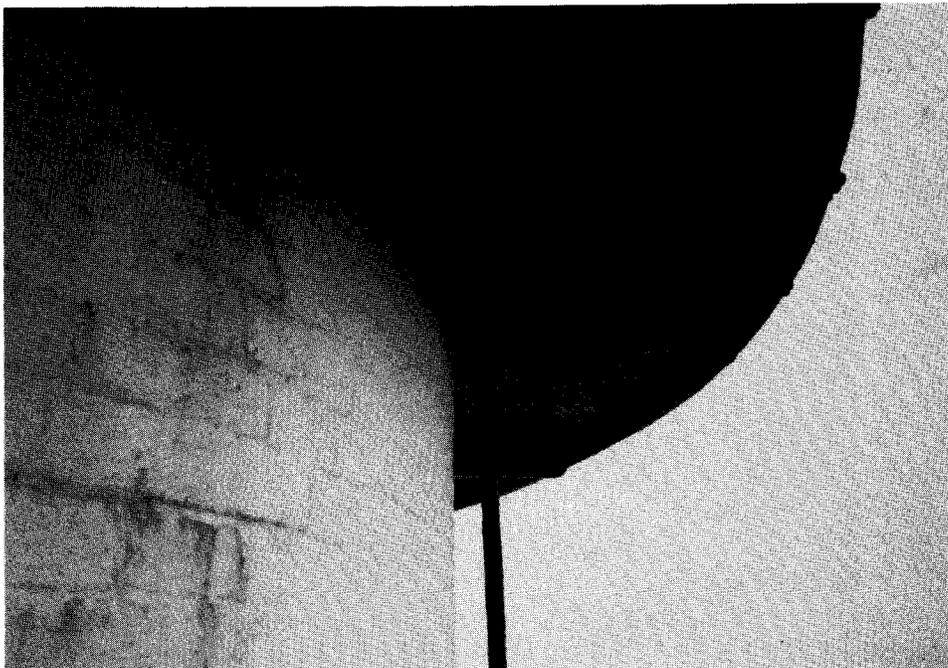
Tower, underside of metal floor of Lantern Gallery.
